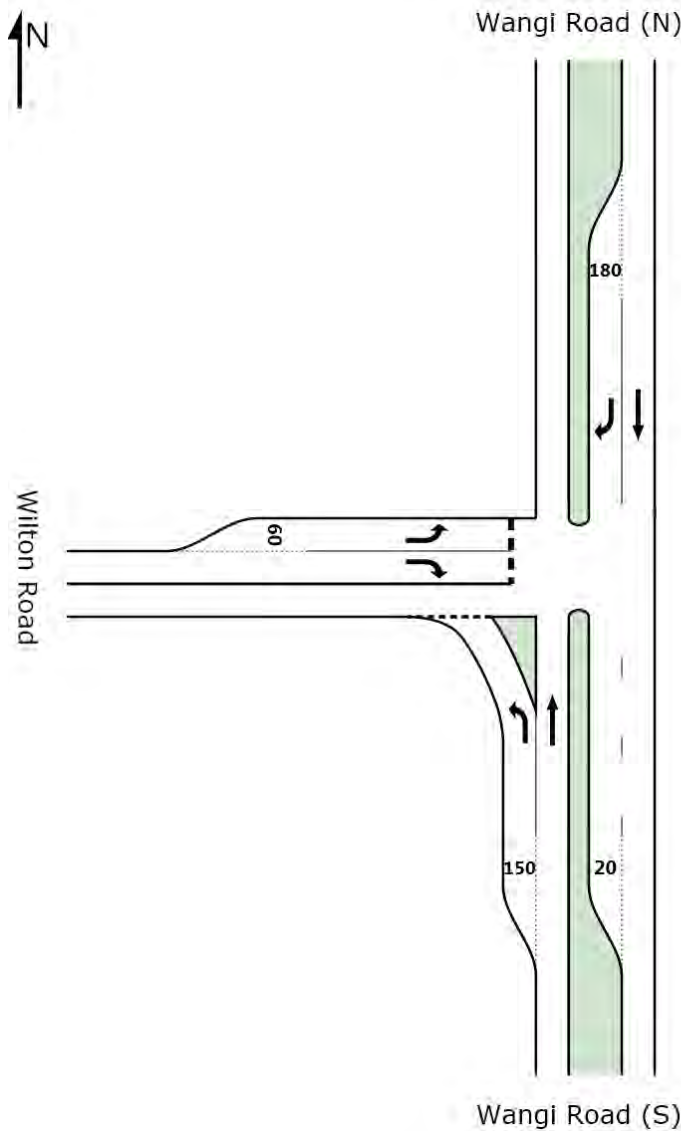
Upgraded Intersection Form of Wilton Road/Wangi Road
